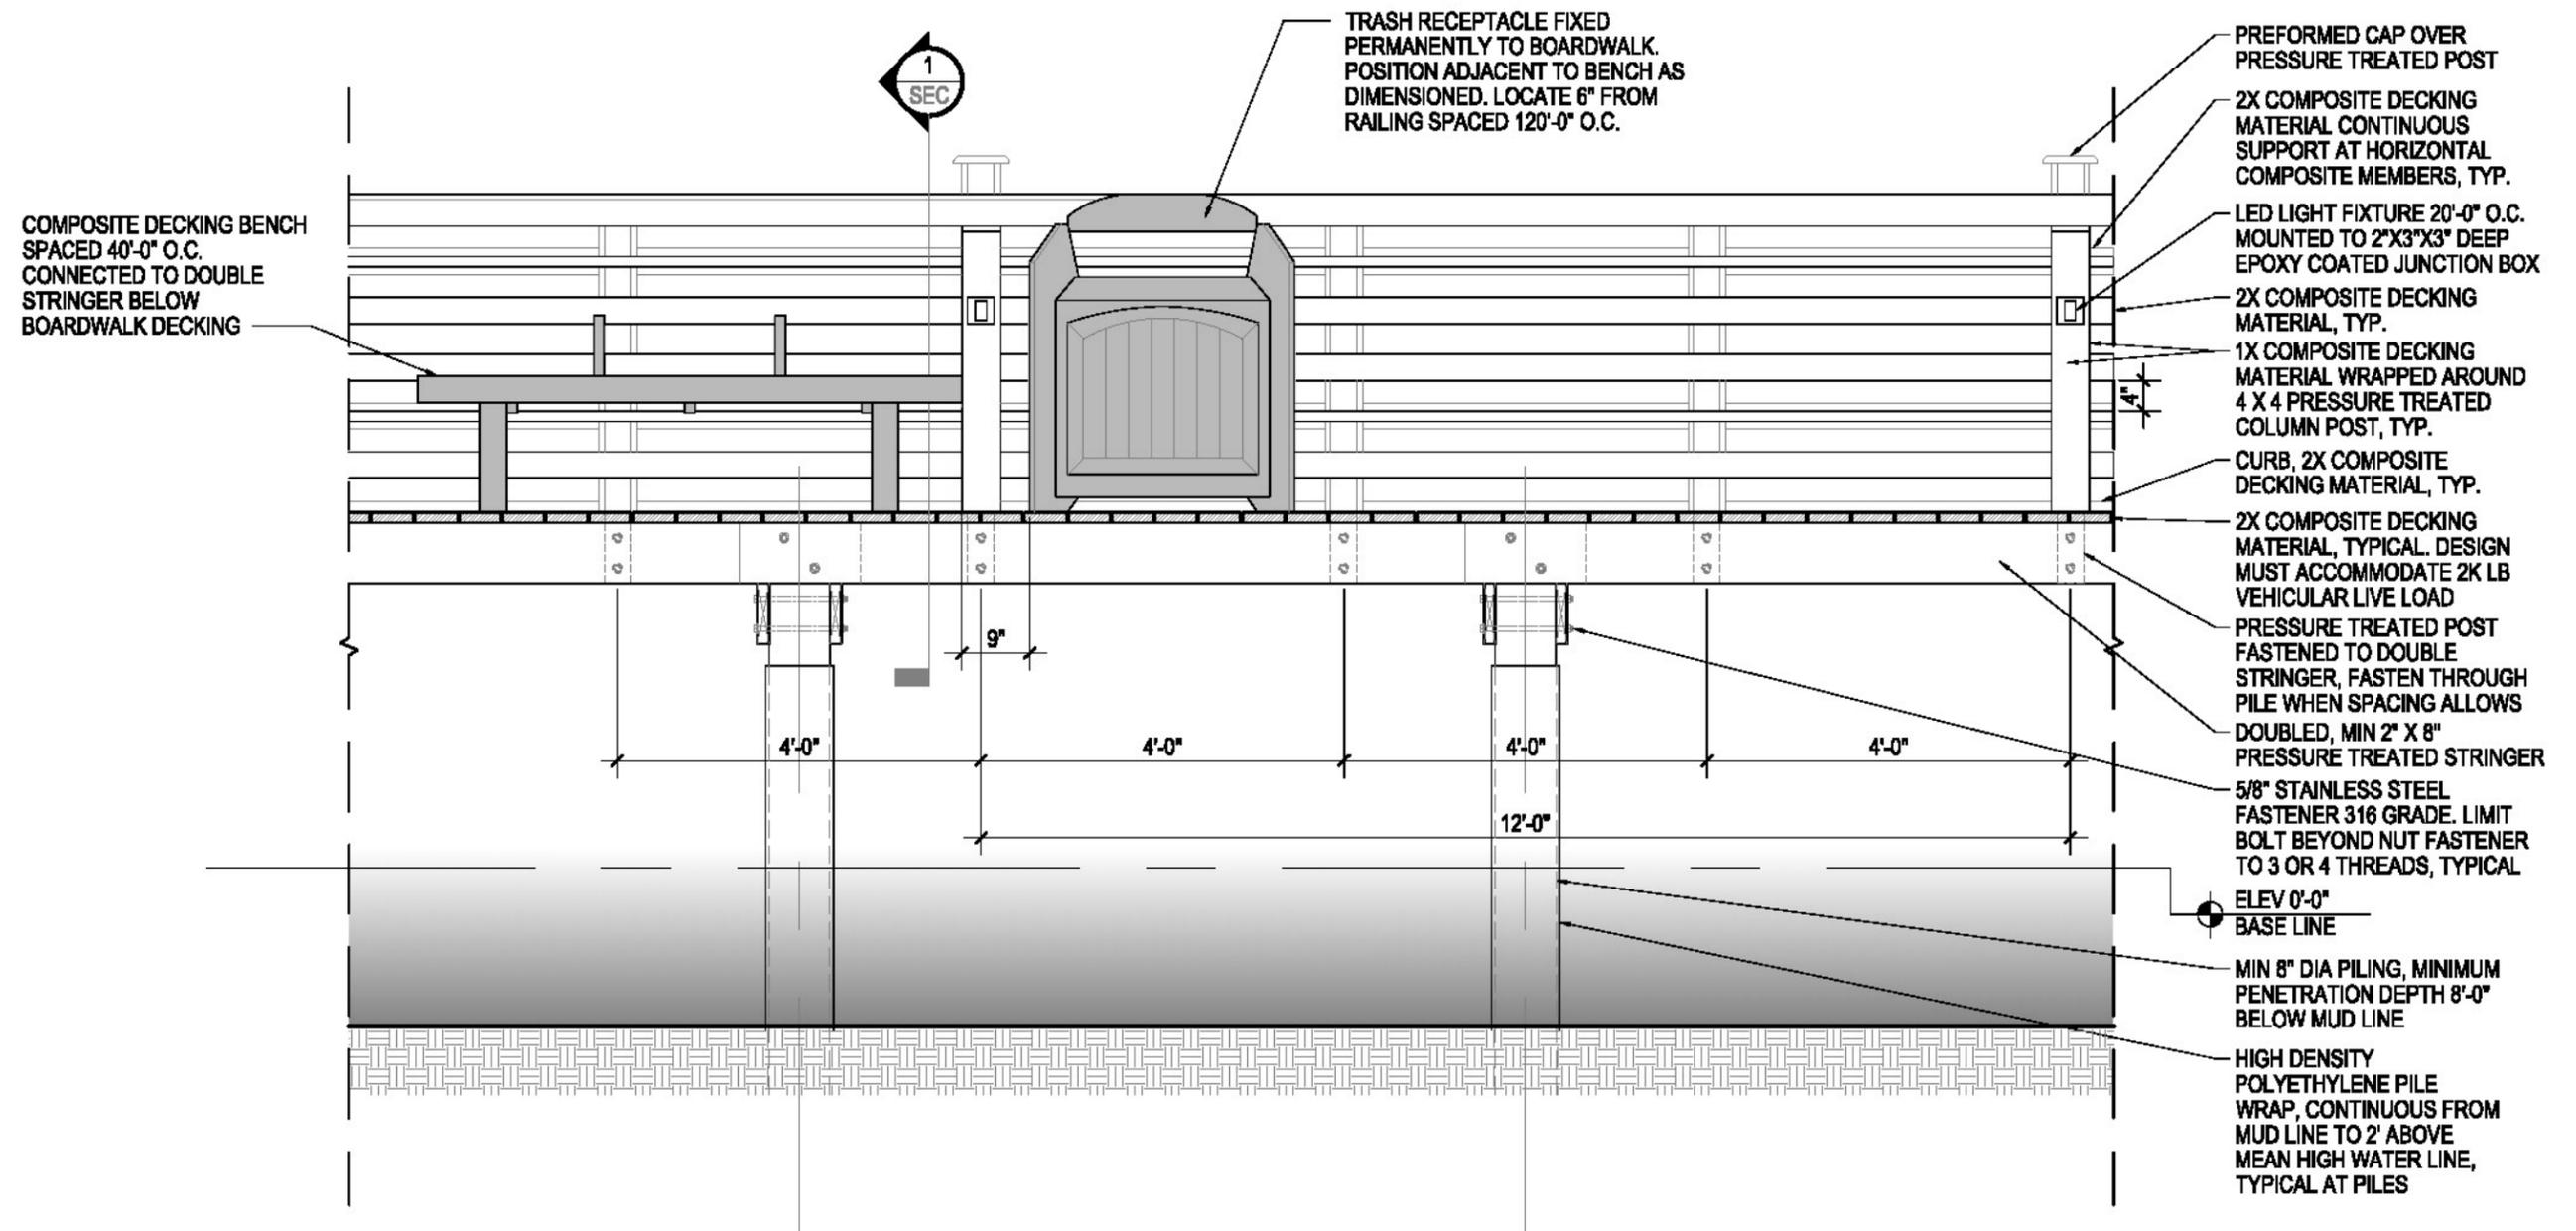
Typical Boardwalk Railing Elevation at 1/2" = 1'-0" Scale
